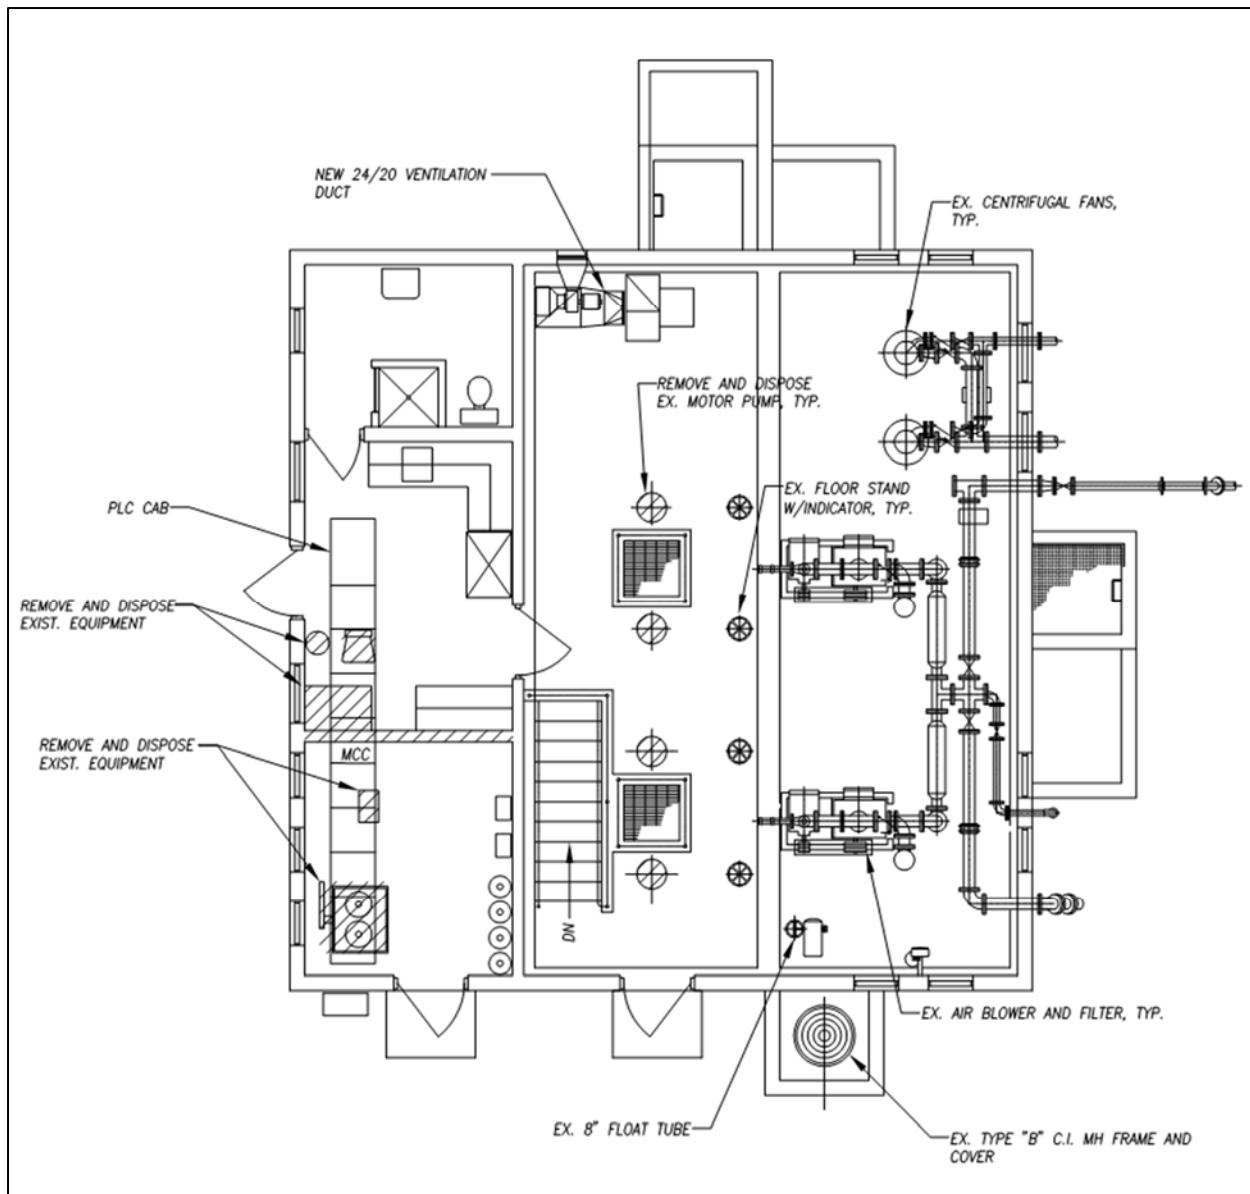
IPS Proposed Layout – Ground Floor
